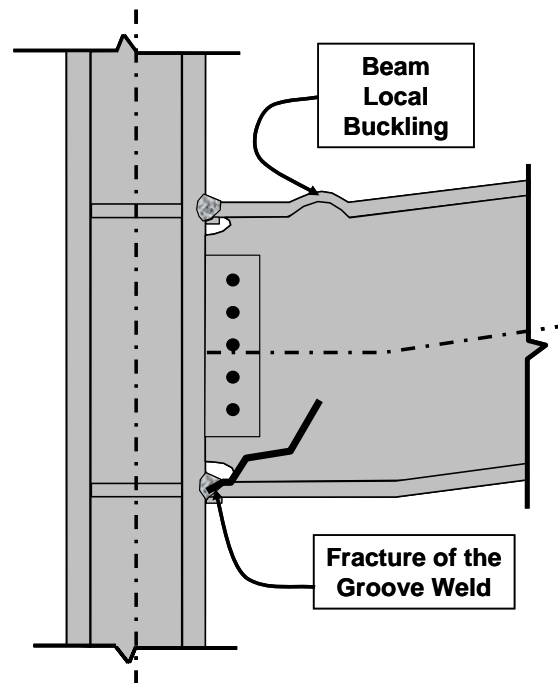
Typical Failure on Pre-Northridge Beam-Column Connection
